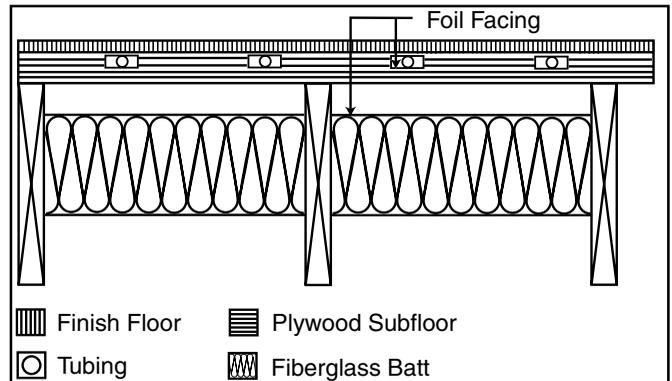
Sandwich construction with foil-faced batts under subfloor and thin nailers.
